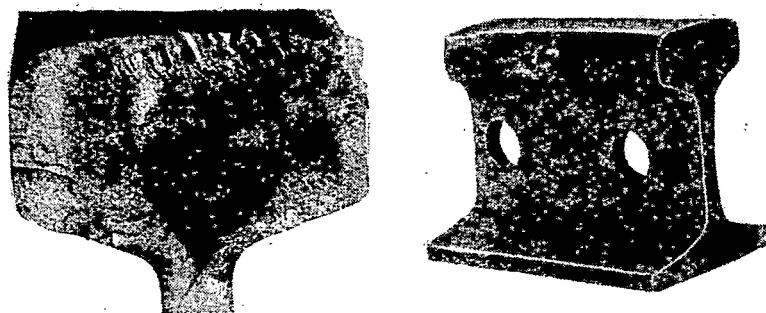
Cracks in the head due to welding of rail connectors.
